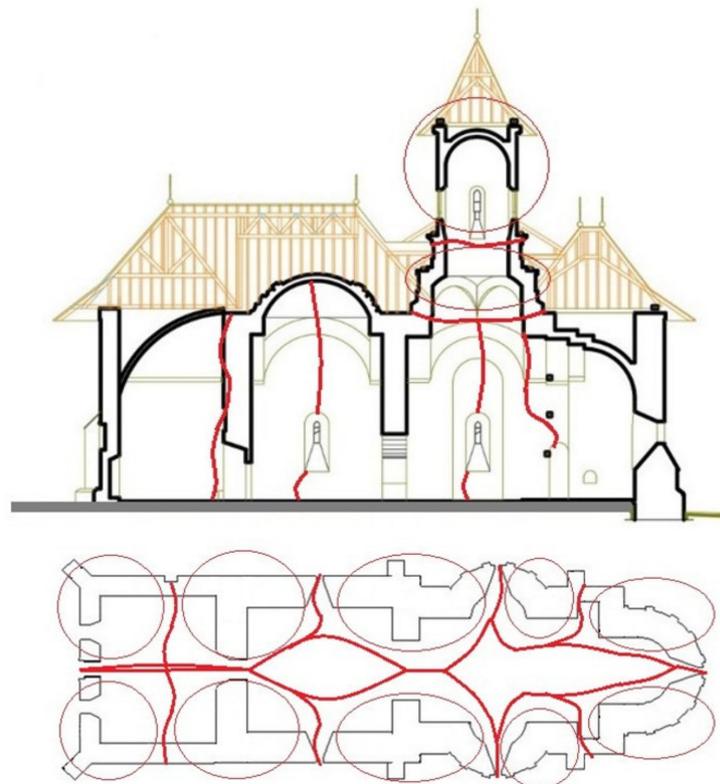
Crack pattern. Multiple transverse fractures (porch, narthex, nave, and Sanctuary) and longitudinal fractures of the church.
